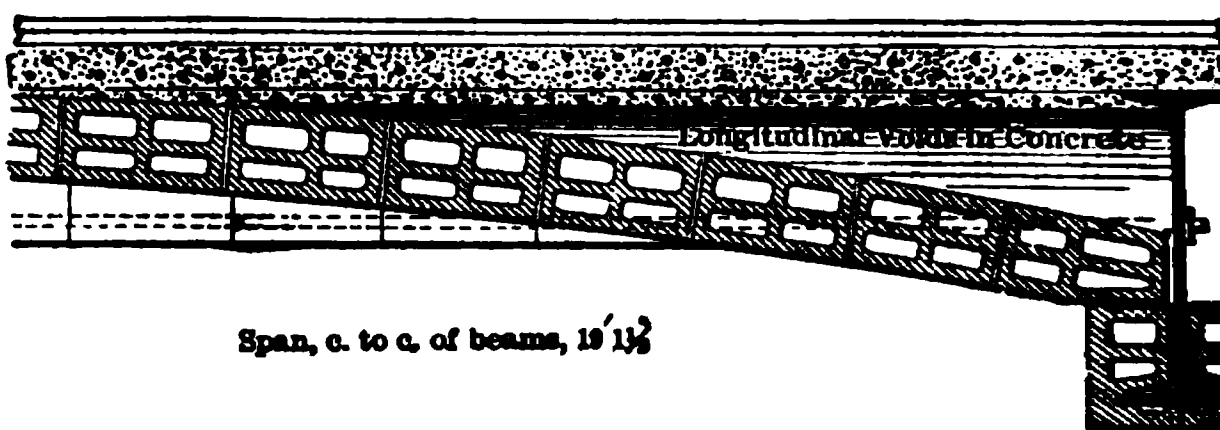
Segmental Tile Floor-arch. Deep Beam. Dropped Skew
